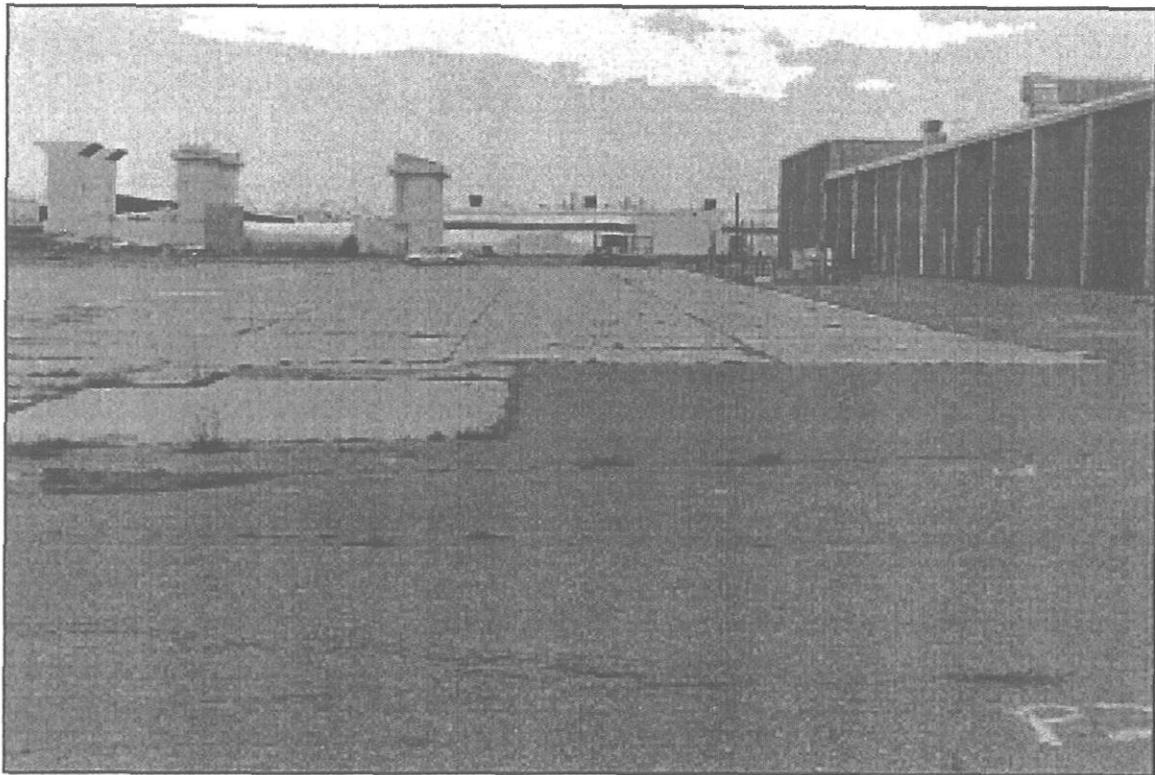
CAA 13, Building 530 - Former aircraft defueling facility on Parcel 211, now the paved area to the west of Building 530 (shown at right). Photo facing north.
